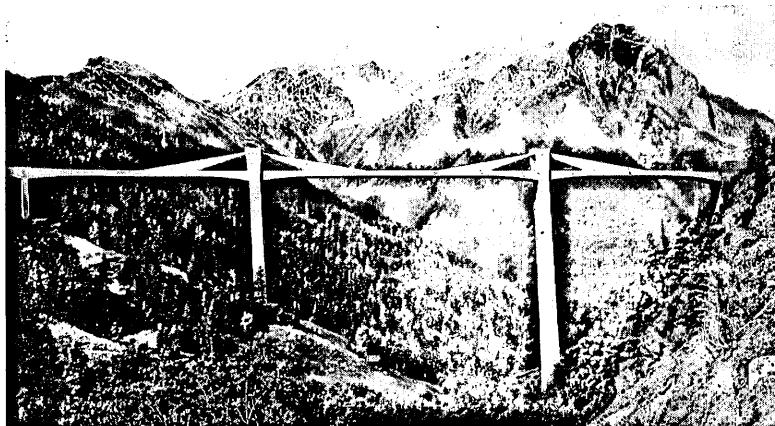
Ganter Bridge. A low cable-stayed bridge with cables encased in concrete.
